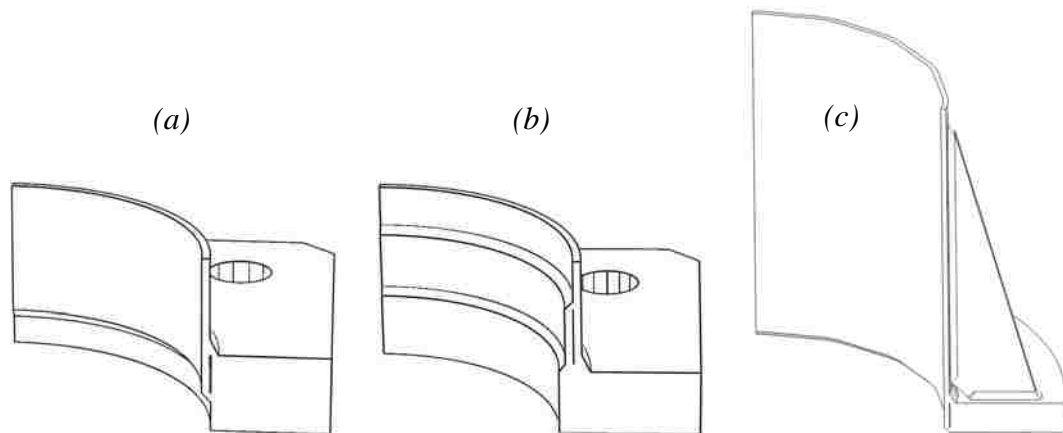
Tube-to-base plate connections: *a*, fillet-welded connection; *b*, full-penetration welded connection; *c*, stiffened fillet-welded connection.
